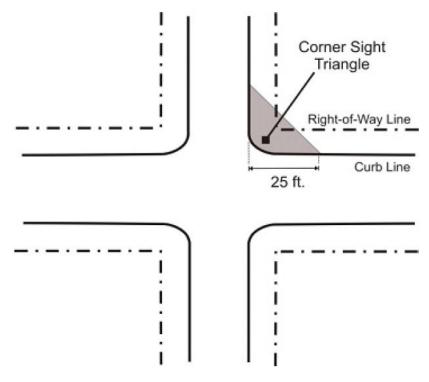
FIGURE. CORNER LOT SIGHT OBSTRUCTION TRIANGLE
